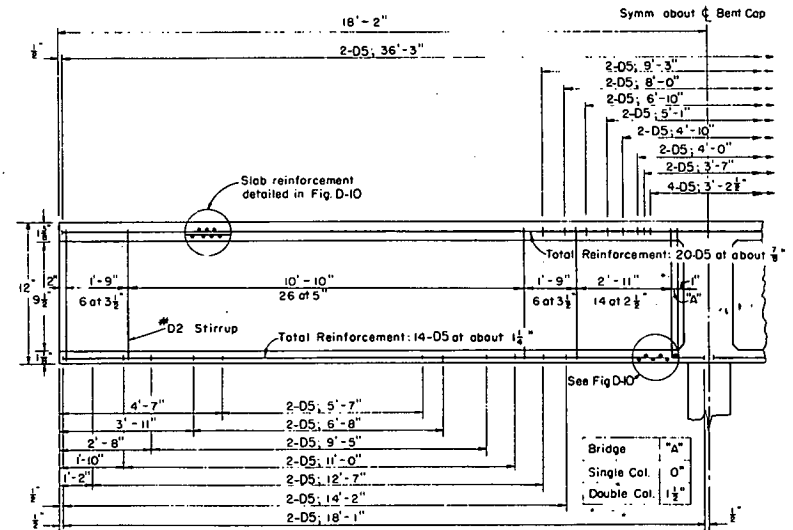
Interior Girder Reinforcement for Model Bridges
